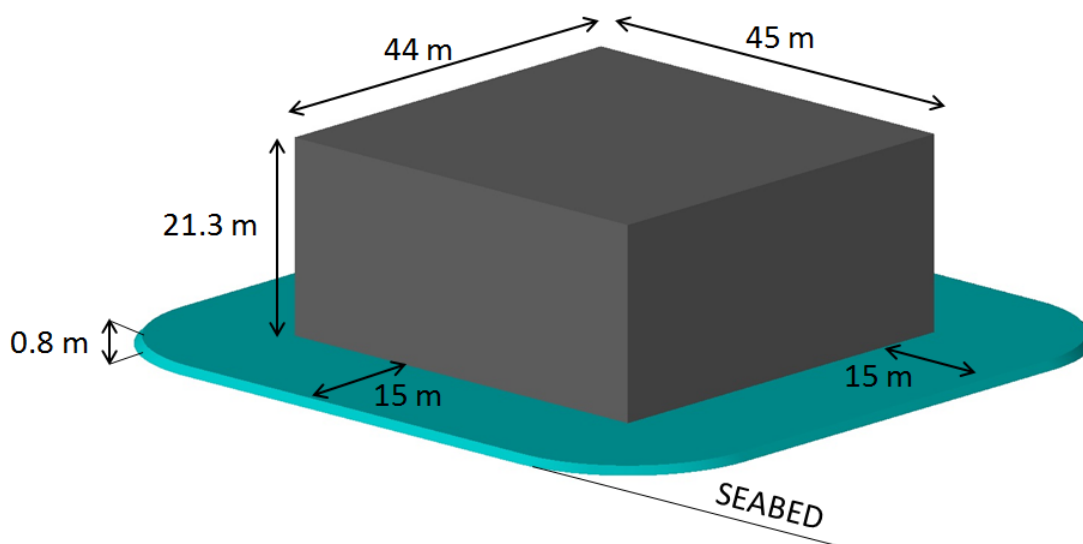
3D Rendering SW Anchor Scour Protection Vertical Wall
